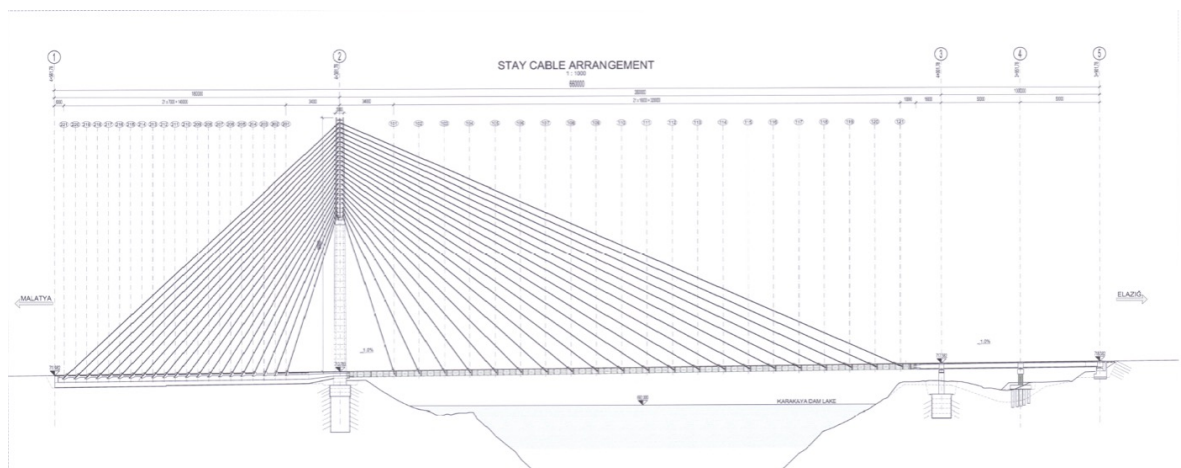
Cable arrangement of New Kömürhan Bridge.
